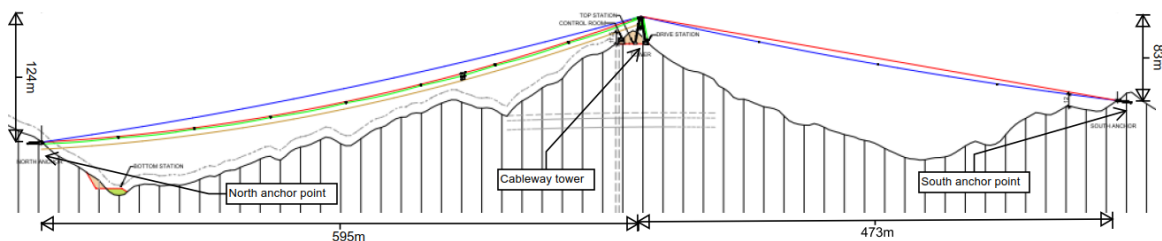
Cableway general arrangement with the north anchor block, the south anchor block and the tower.
